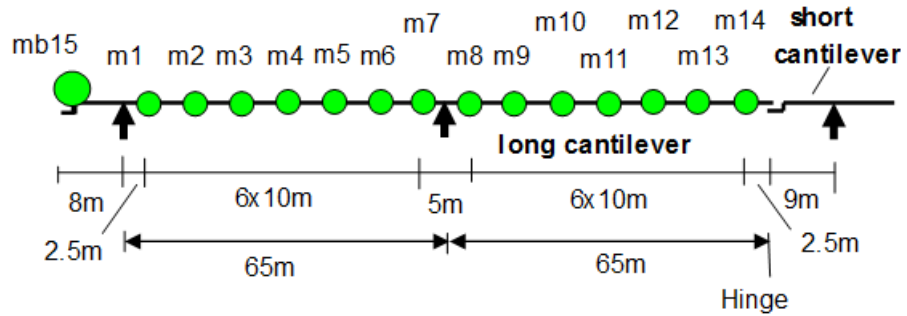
Bridge frame Case “3” with adjacent long cantilever mass reaction at J#1
